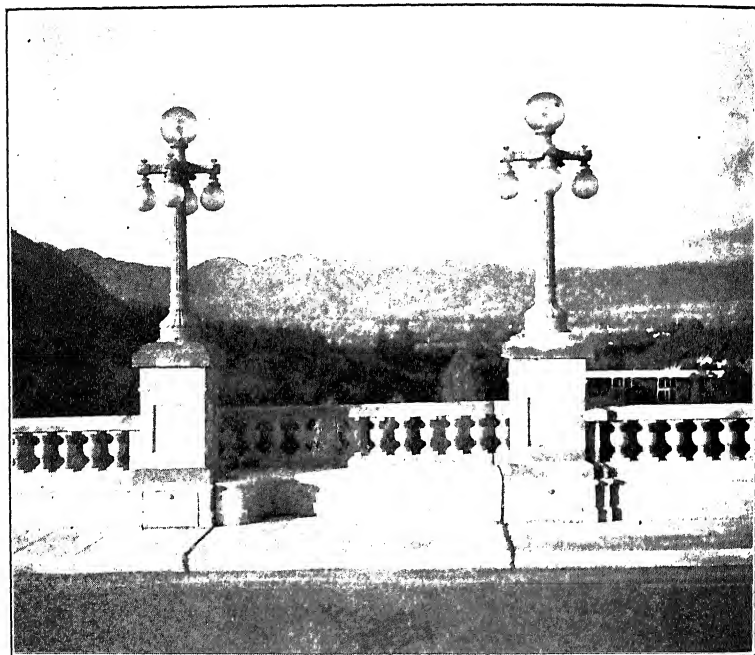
Bridge over the Arroyo Seco, Pasadena, Cal.
